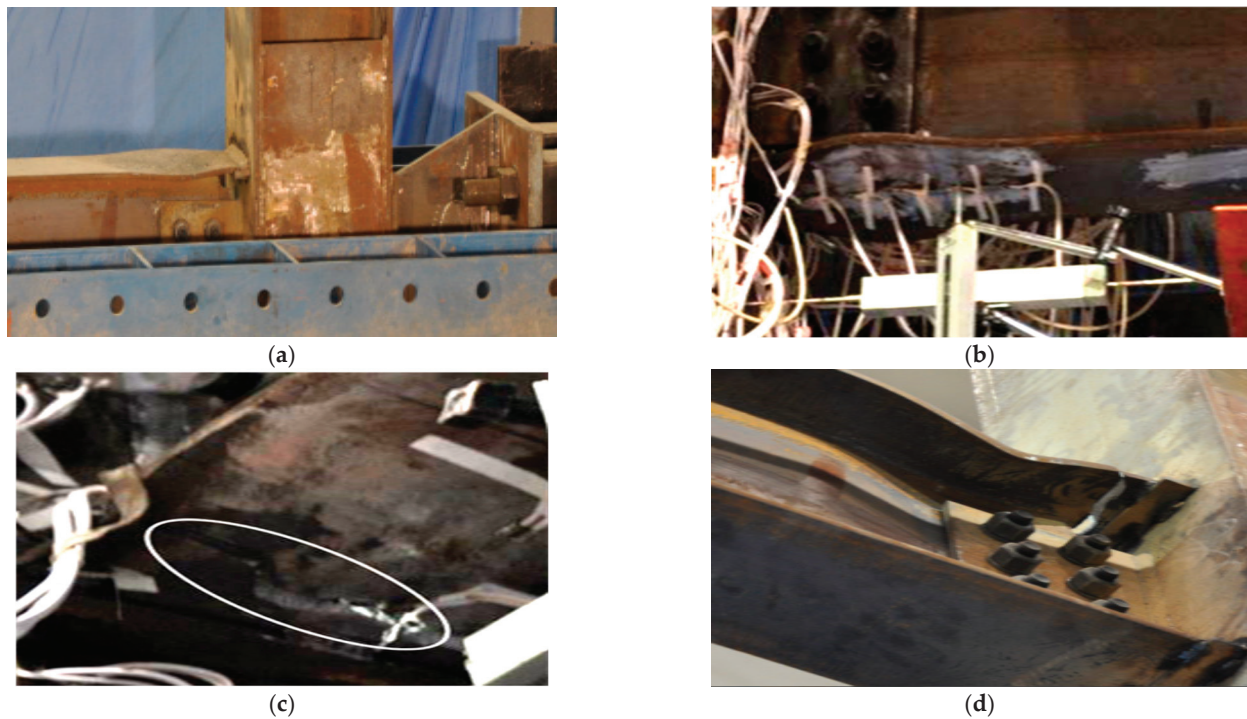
The local failures of the specimen: (a) the beam upper flange buckling in area I; (b) the beam lower flange buckling in area II; (c) the beam lower flange fracture in area II; (d) the beam upper flange fracture and web buckling in area I.
